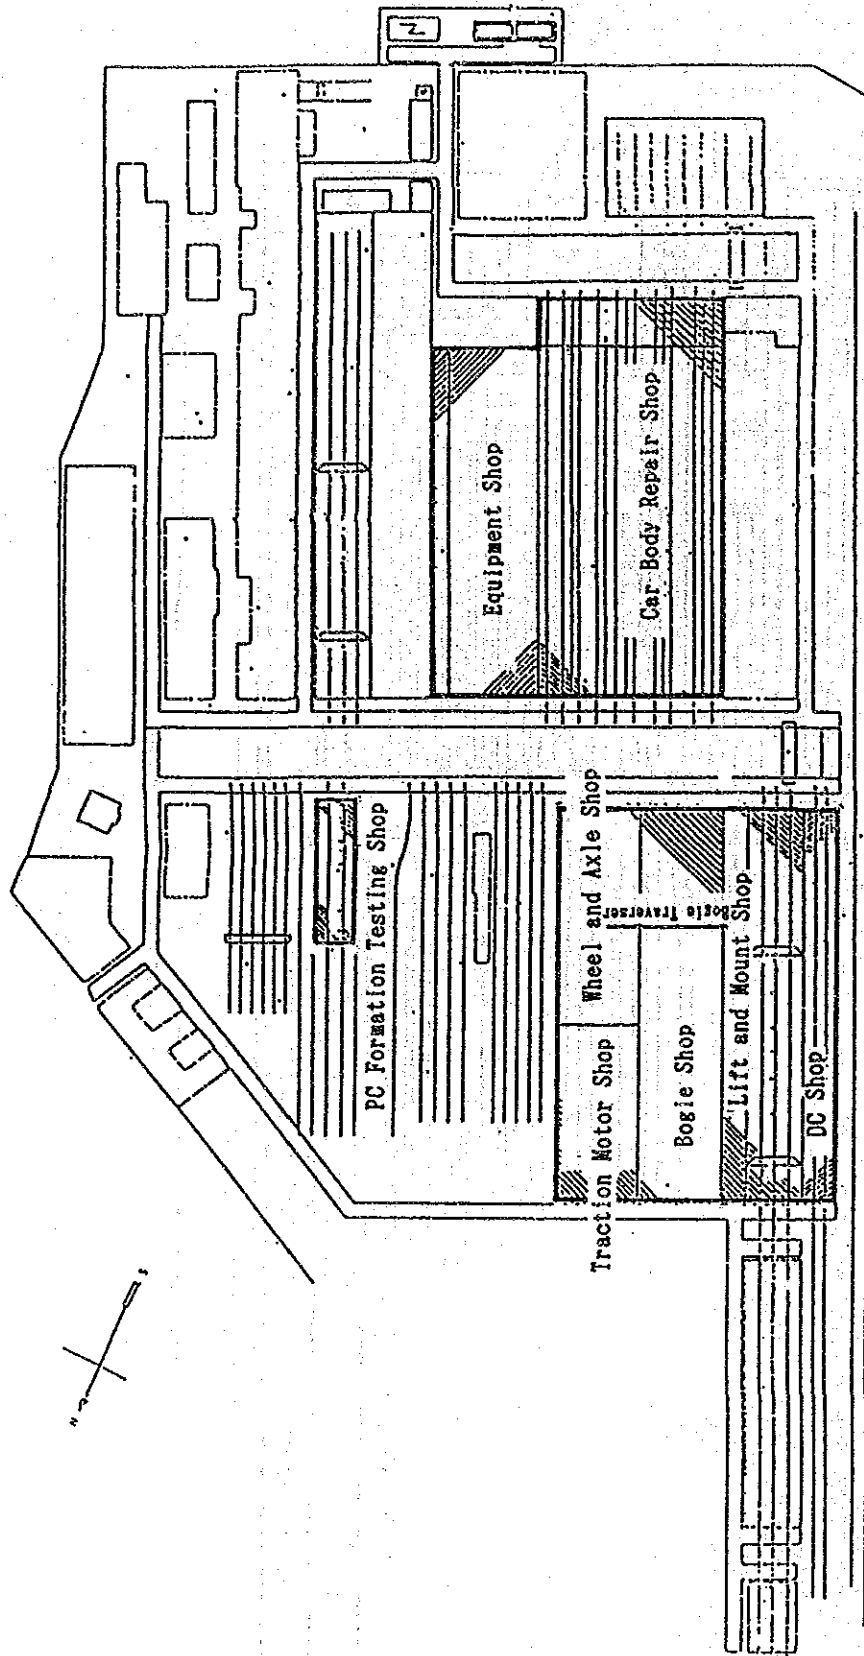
Layout of Improvement Plan for Manggarai Workshop
